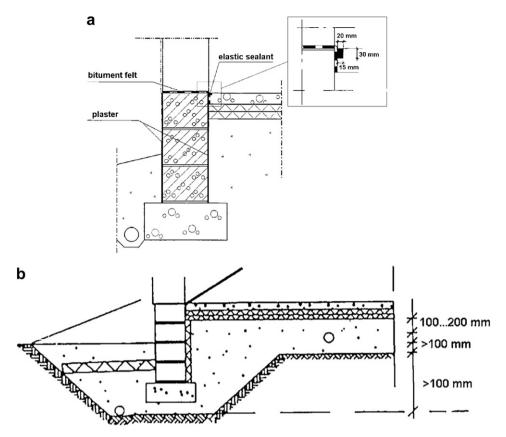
Radon protection measures; (a) sealing of the joint between foundation wall and floor slab, when the foundation wall is made of permeable material; (b) installation of a suction pipe in the gravel layer [33].
